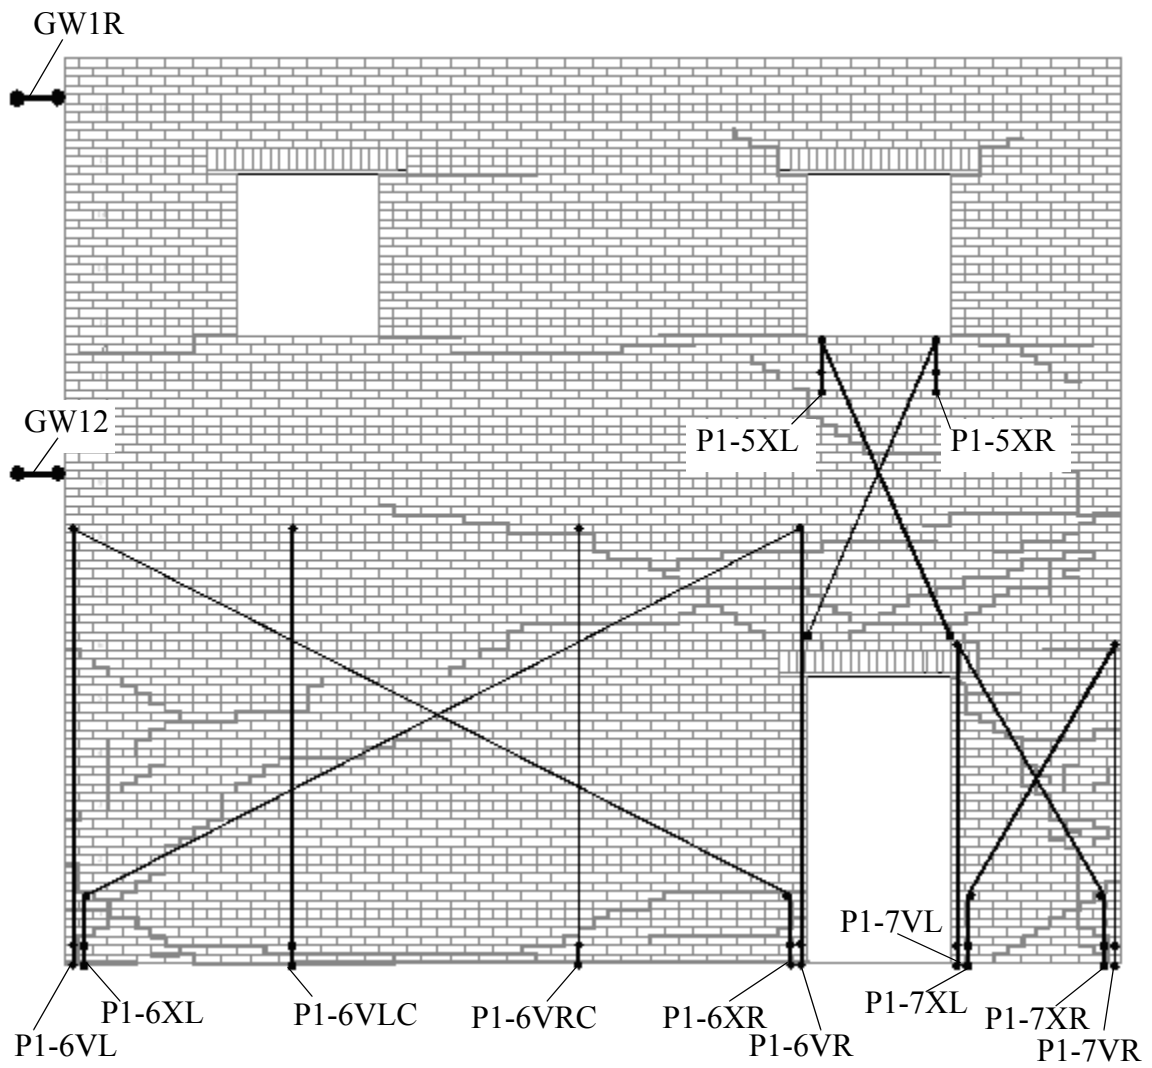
Elevation view of Wall 1 illustrating the location of LVDTs.
